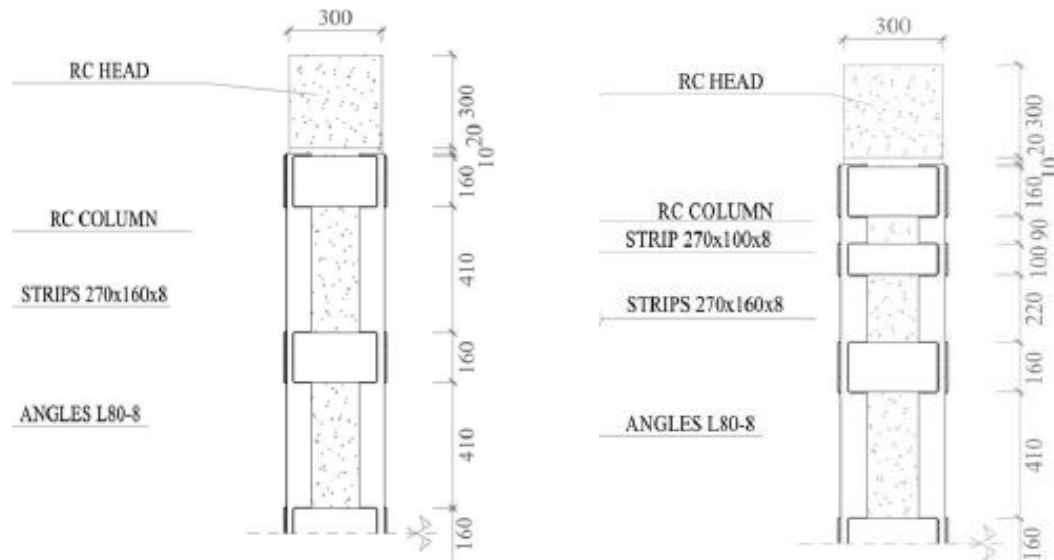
Columns with uniform and non-uniform steel strip placement [17]
